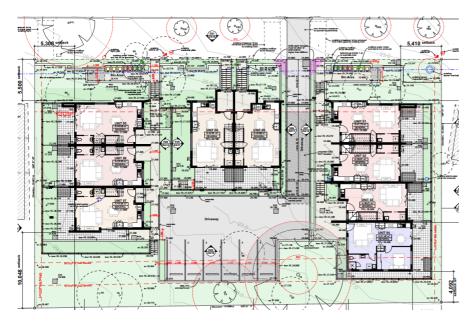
Extract from Architectural Plans – Site & External Works Plan – Ground Floor (Source: Architectural Plans, Stanton Dahl Architects, dated 14 July 2023)
